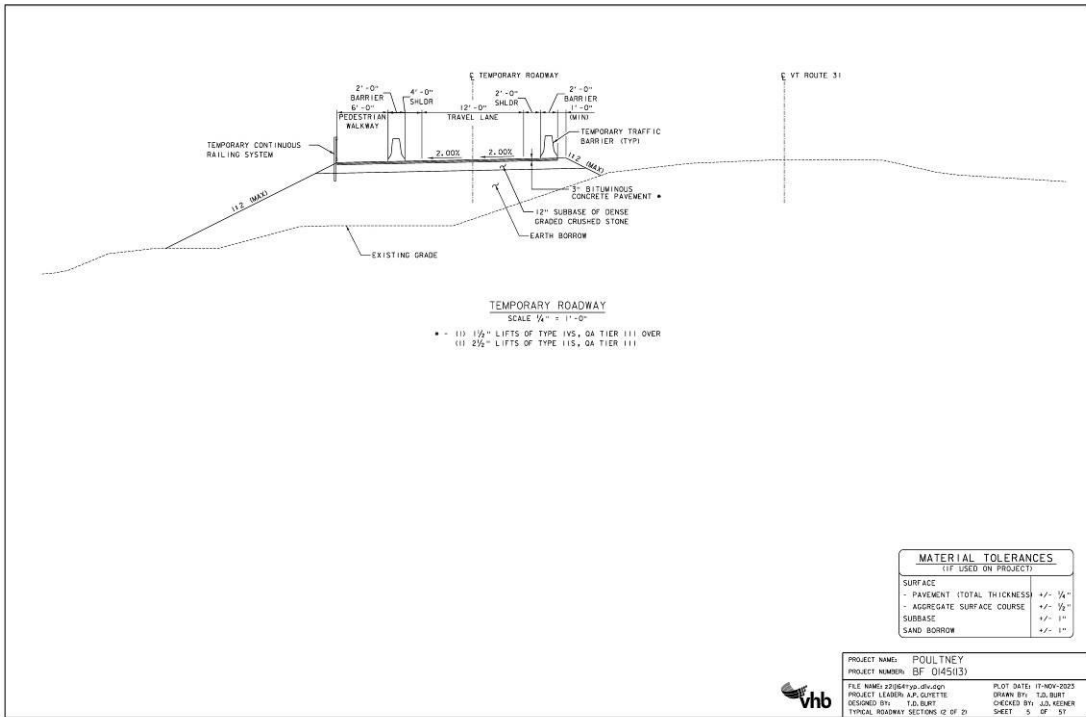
Diversion Roadway Typical Section, Preliminary Plans, Sheet 5 of 57, November 2023.
